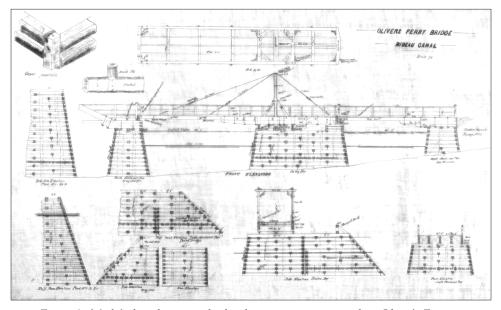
Modified timber swing bridge design prototype, erected at Oliver's Ferry in 1874. (Library & Archives Canada, NMC # 130281, "Olivers Ferry Bridge," n.d.)
